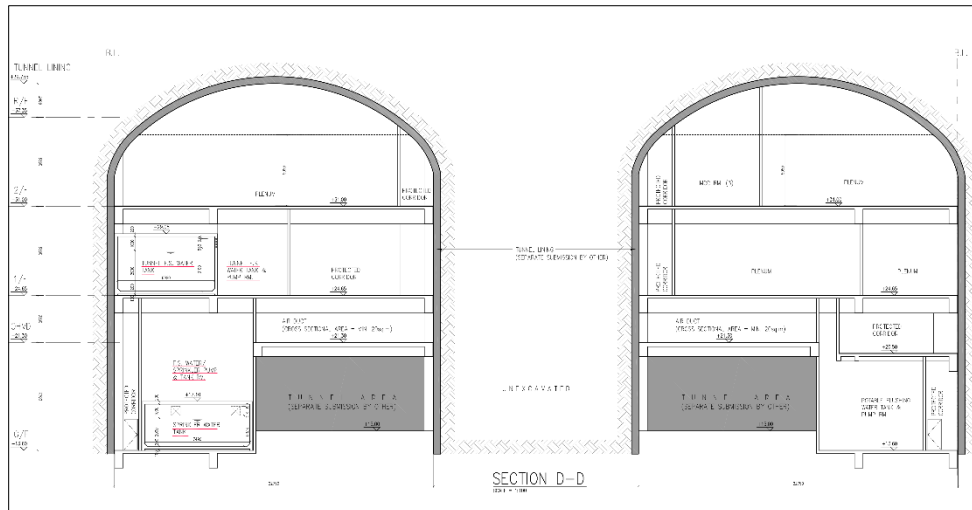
Cross Section of Semi-caverns and EVB Facilities
